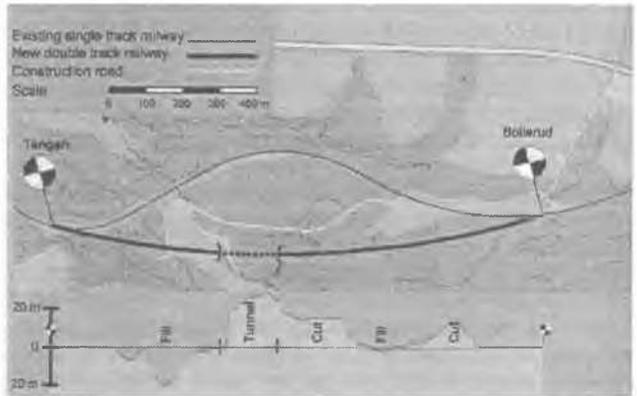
Plan view and profile, Tangen to Bollerud, Nykirke railway link (Hermann & Jensen, 2000).
